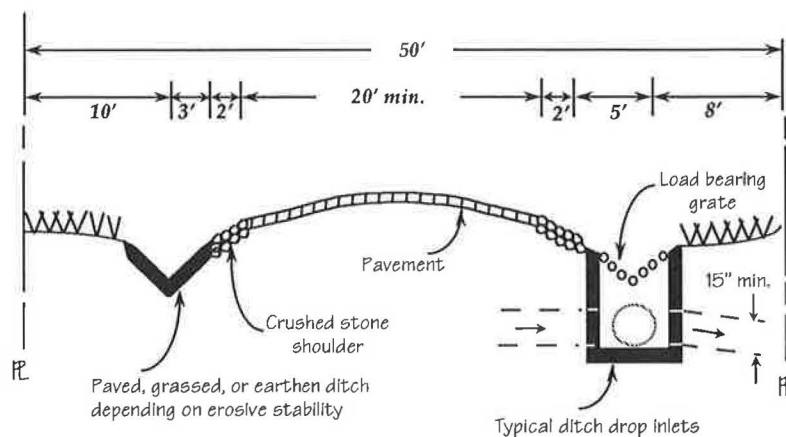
Cross section of typical urban local street, ditch section (not to scale).
